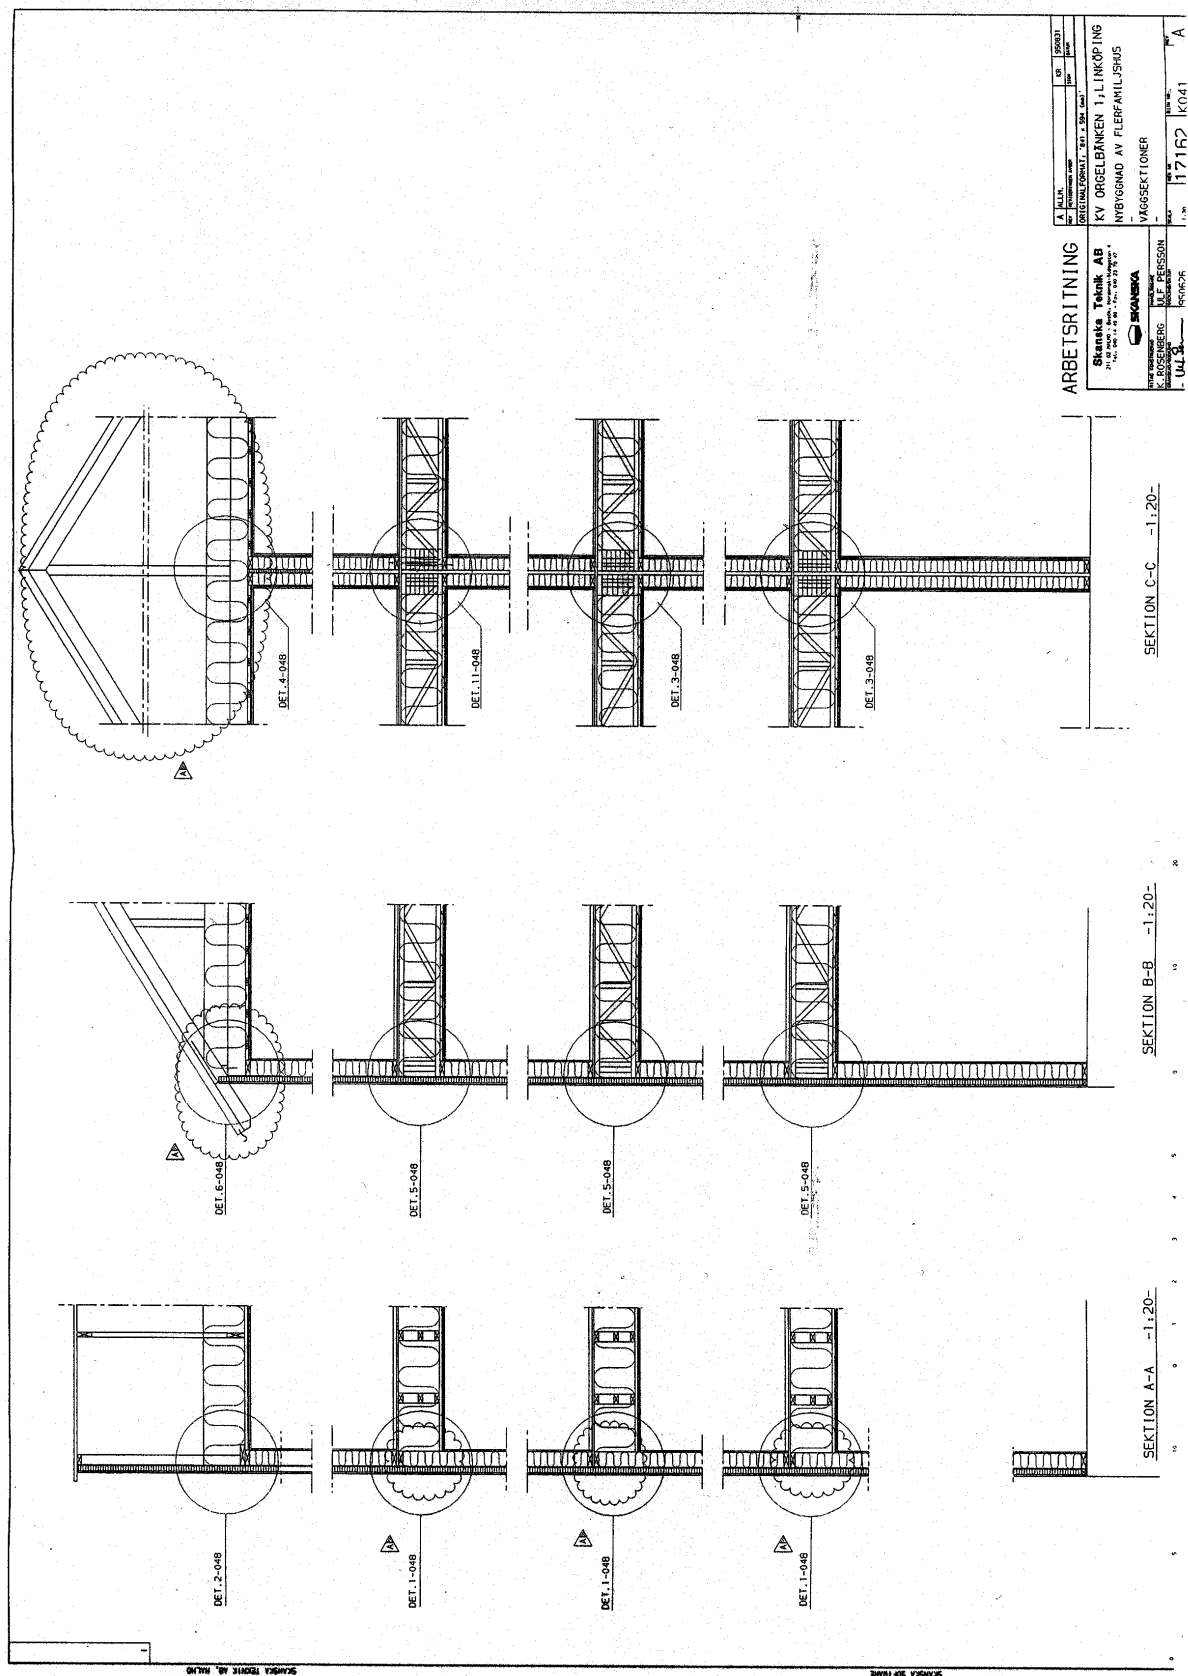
Sections showing details of wall assemblies. The load-bearing construction is carried out of wood, indoors covered by gypsum boards.
